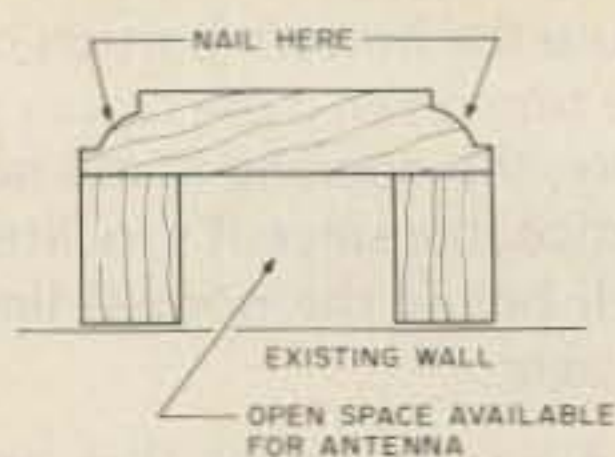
Profile view of an alternative method used to mount the Hidden Hypo on a flat wall.
